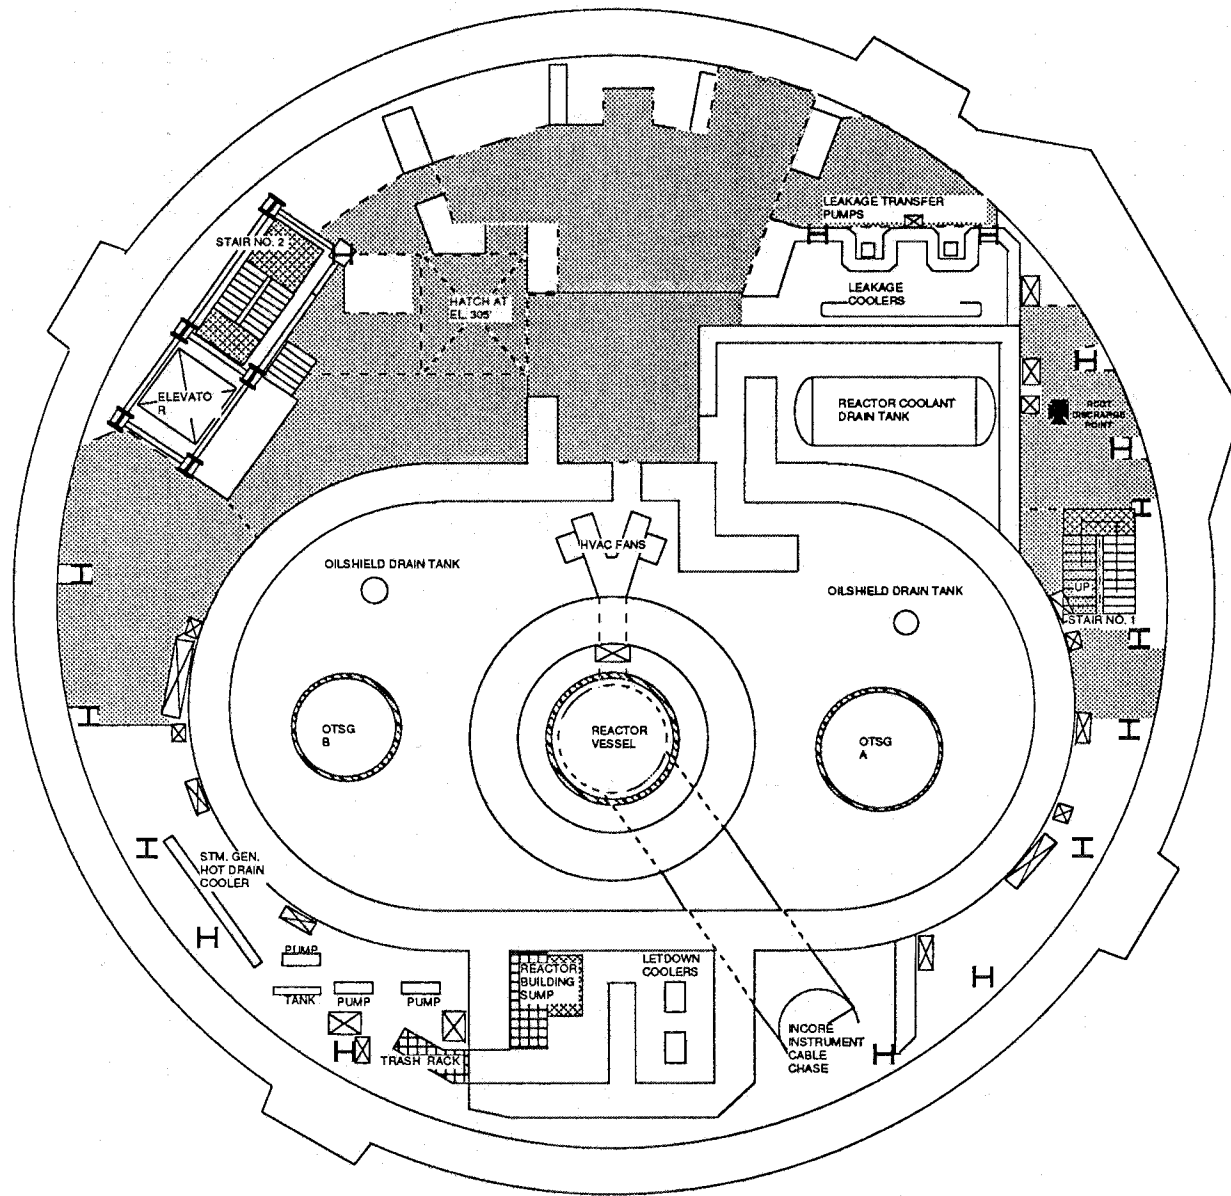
Containment Basement Floor Plan Showing Areas Accessible to Remotely Operated Vehicles
